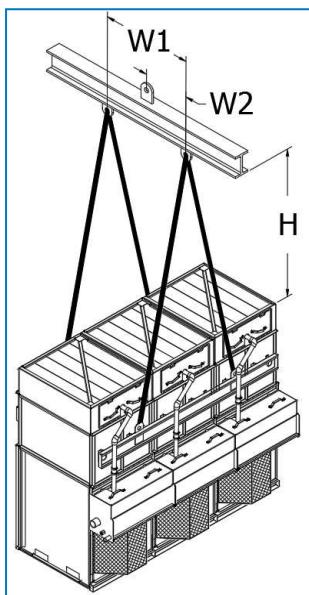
Lifting of factory-assembled multi-module unit (three module unit shown)
